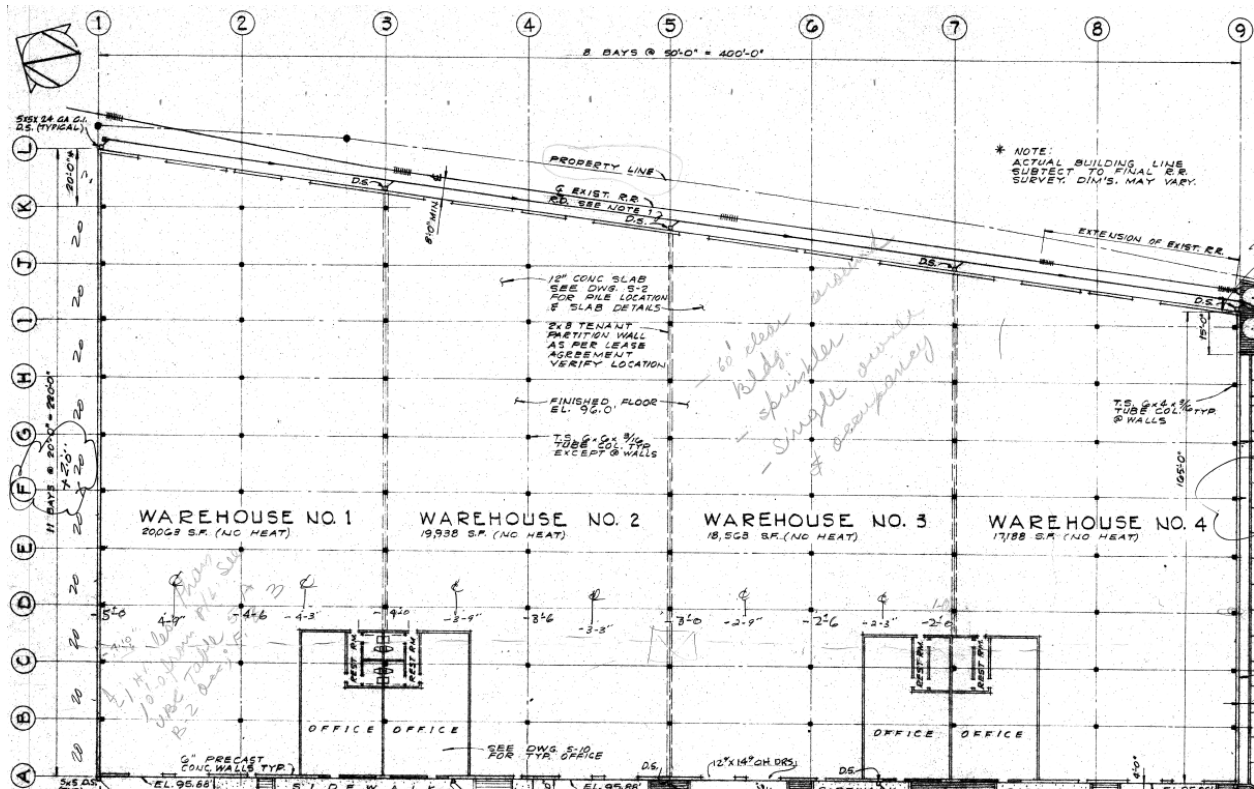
Plan view of Parcel B warehouse (from sheet S-3 of September 4, 1979 drawing by E.L. Engineering)
